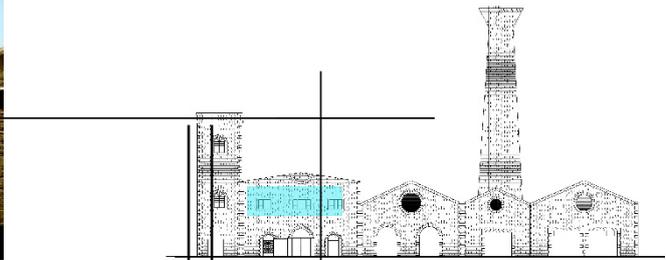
Later Addition, openings on Barrack A, south-east facade, 15 to 17A, East Wharf, KPT, Karachi.
